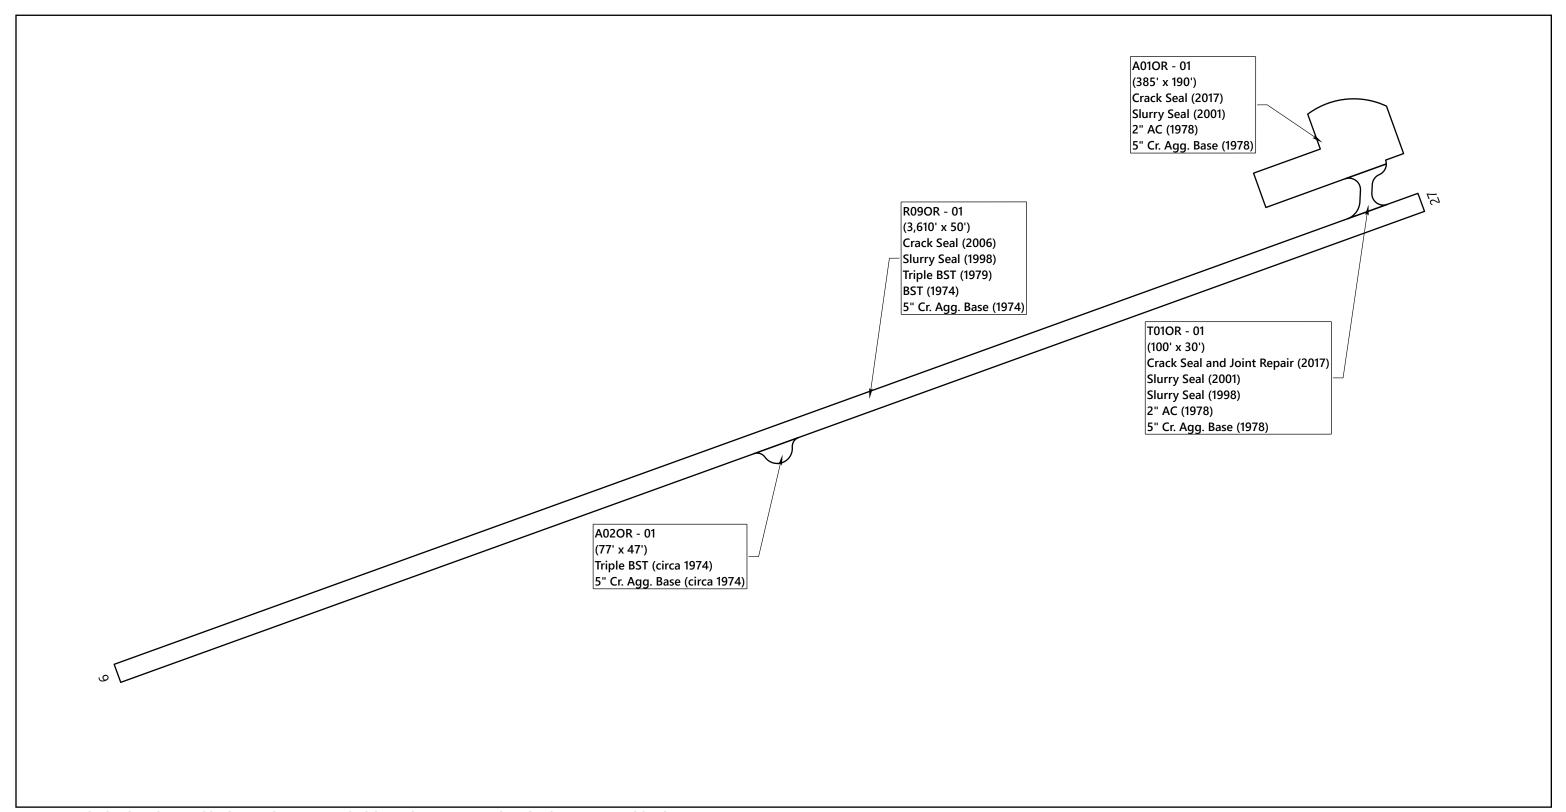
OAKRIDGE STATE AIRPORT PAVEMENT AREA BY BRANCH USE
